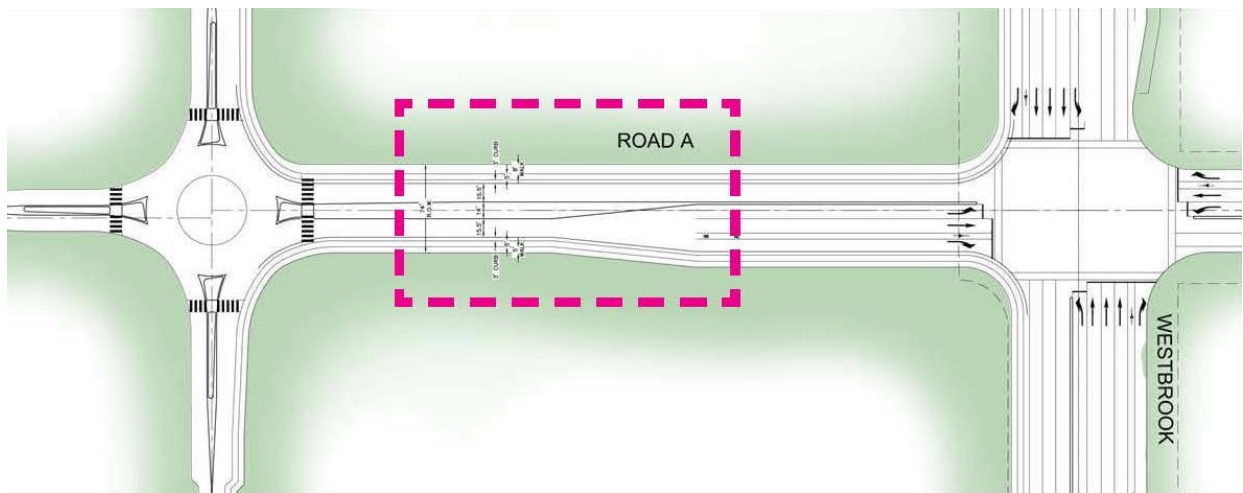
1: Modified Primary Residential Street Connections – Road A
